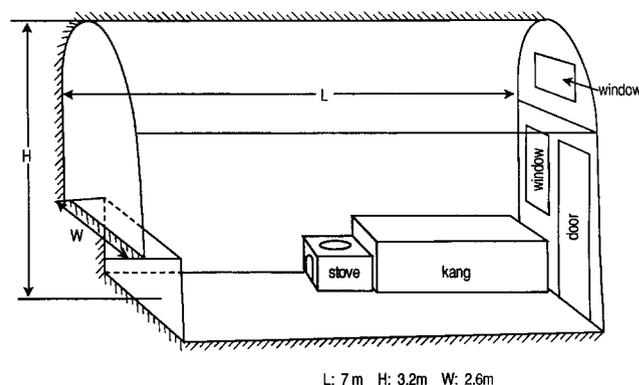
Dimensions of a typical room (cave) of an underground dwelling.
